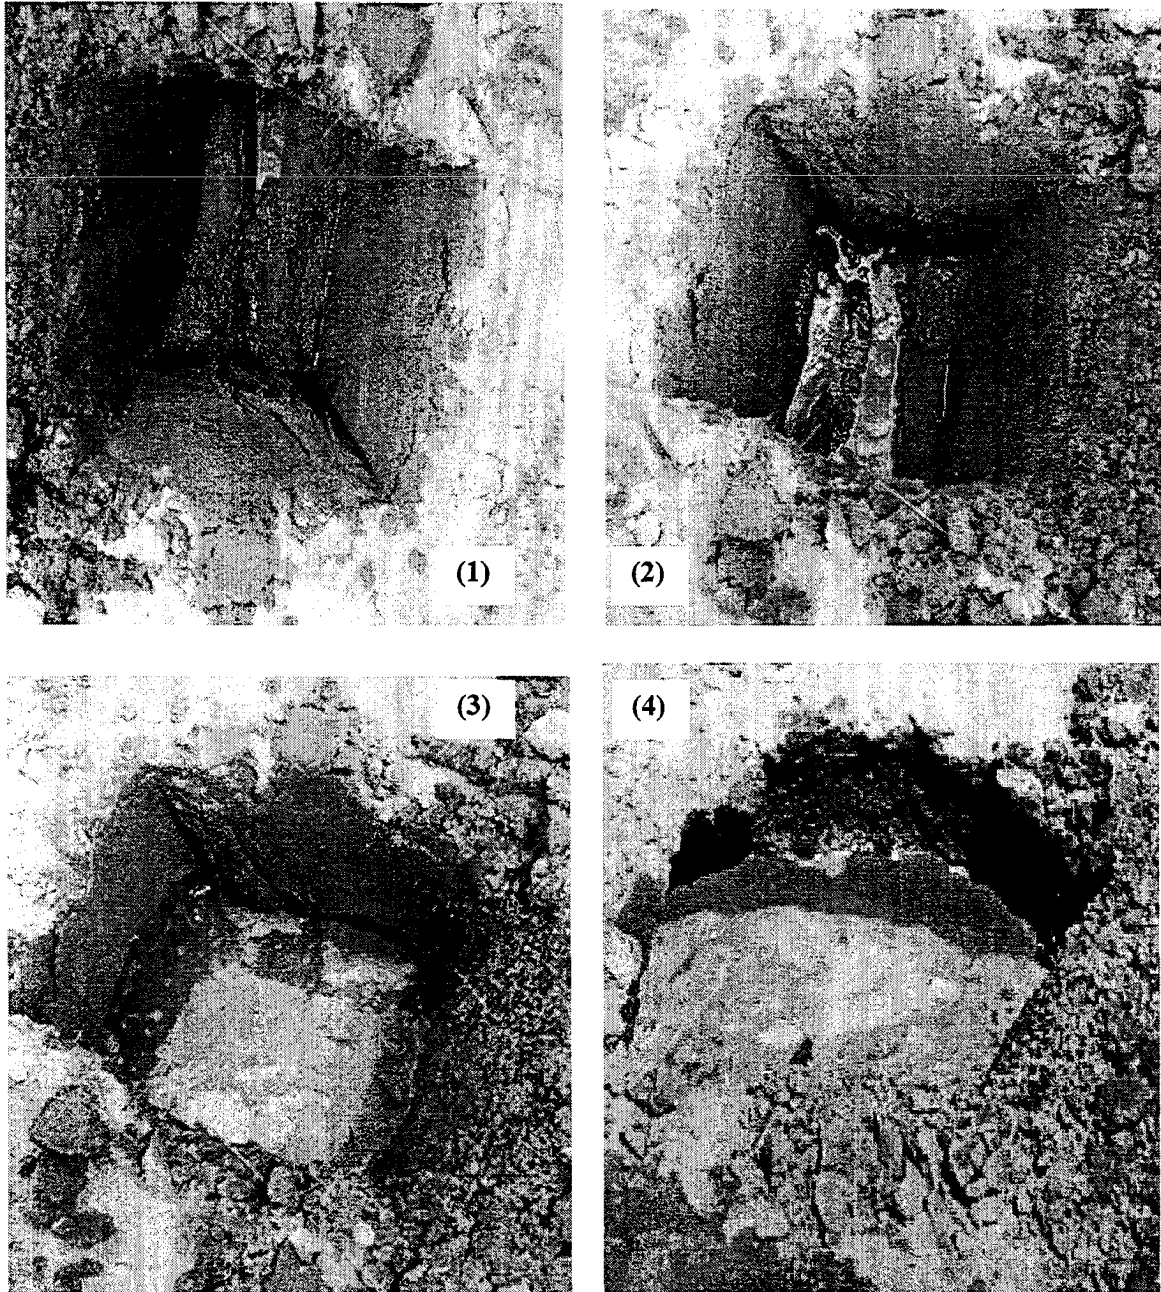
Sequential photographs of test pit excavation over a 10 minute span indicating heavily saturated embankment
